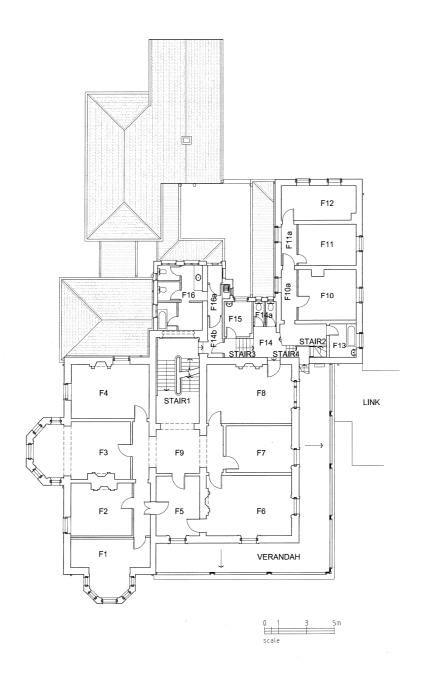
Graythwaite first floor plan of the House, existing conditions, not to scale. Source: Tanner Architects 2010.
